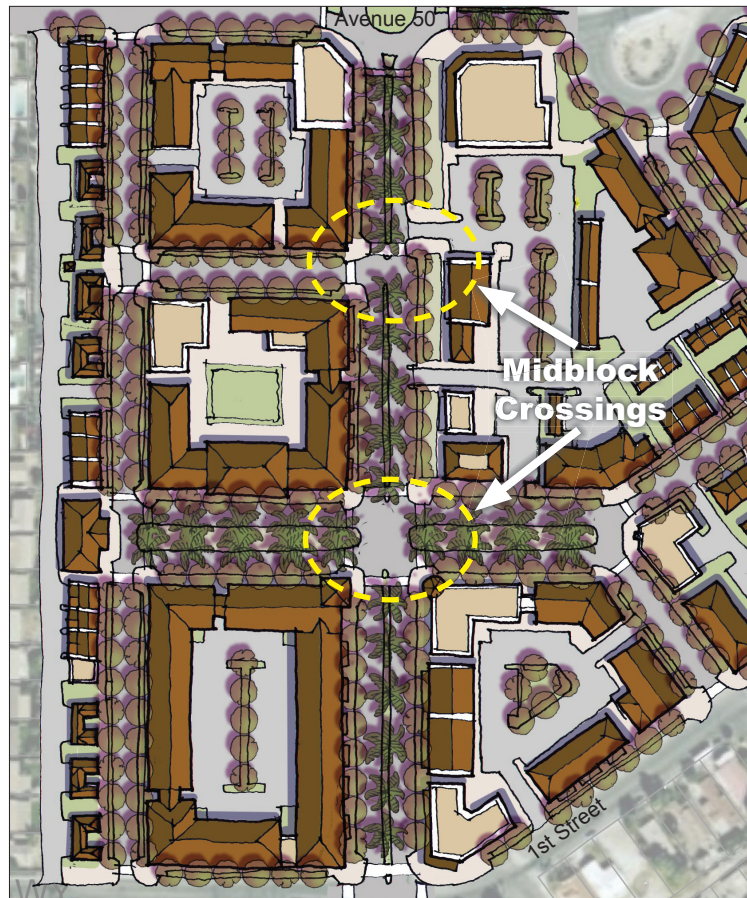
Before later stages of development, midblock crossings should be installed in the locations indicated between Avenue 50 and 1st Street.
